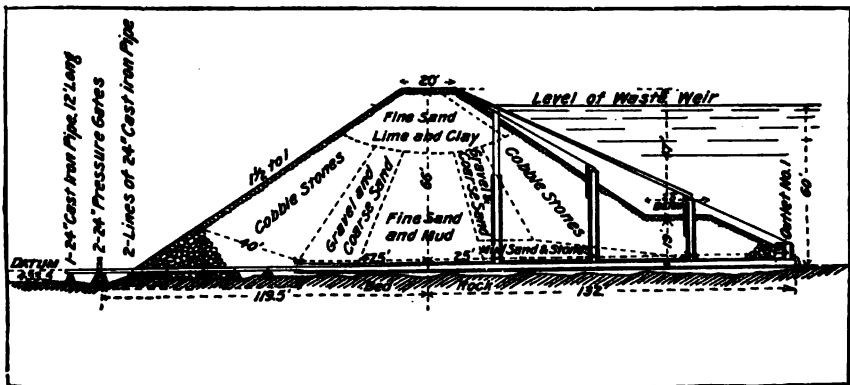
CROSS-SECTION OF LA MESA DAM.
